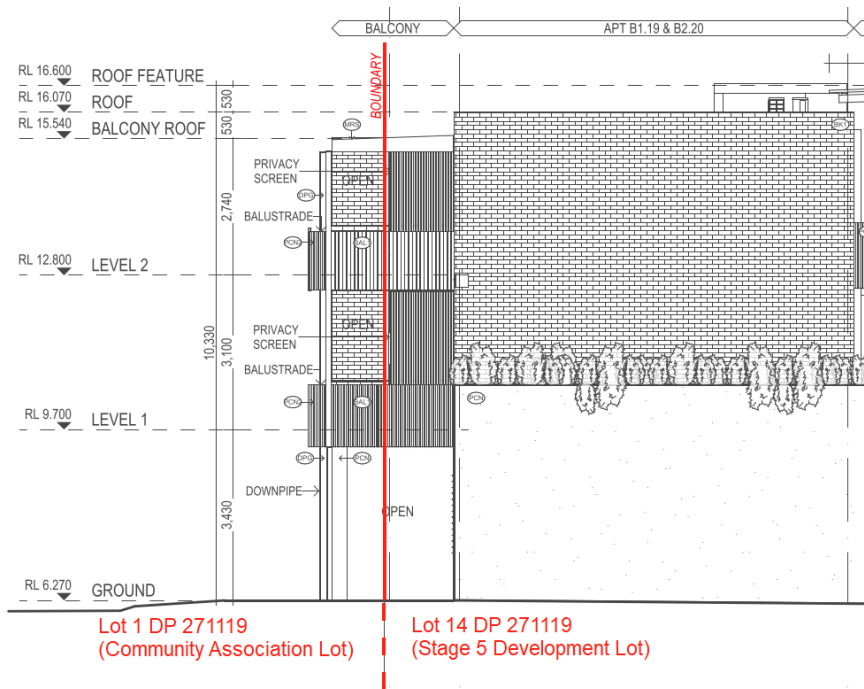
SE Elevation showing the building extending across Lot 1 and Lot 14 in DP 271119.
